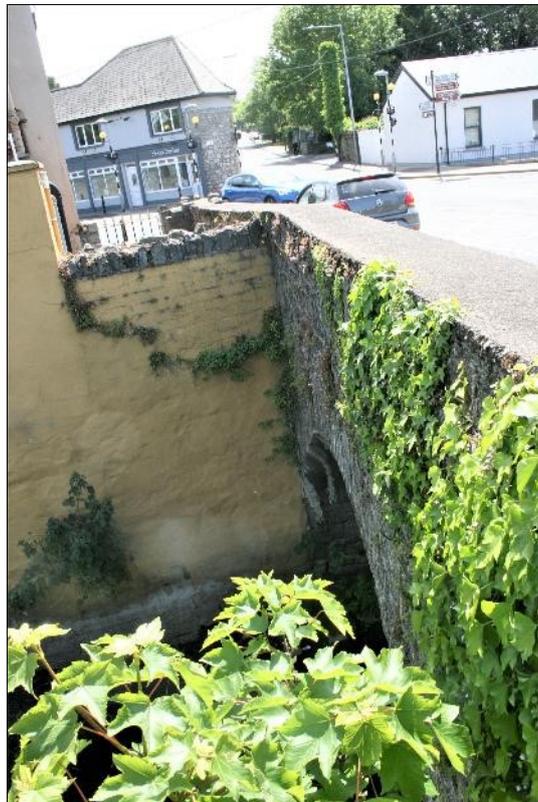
North-east elevation abutting south-east bank at existing public house
